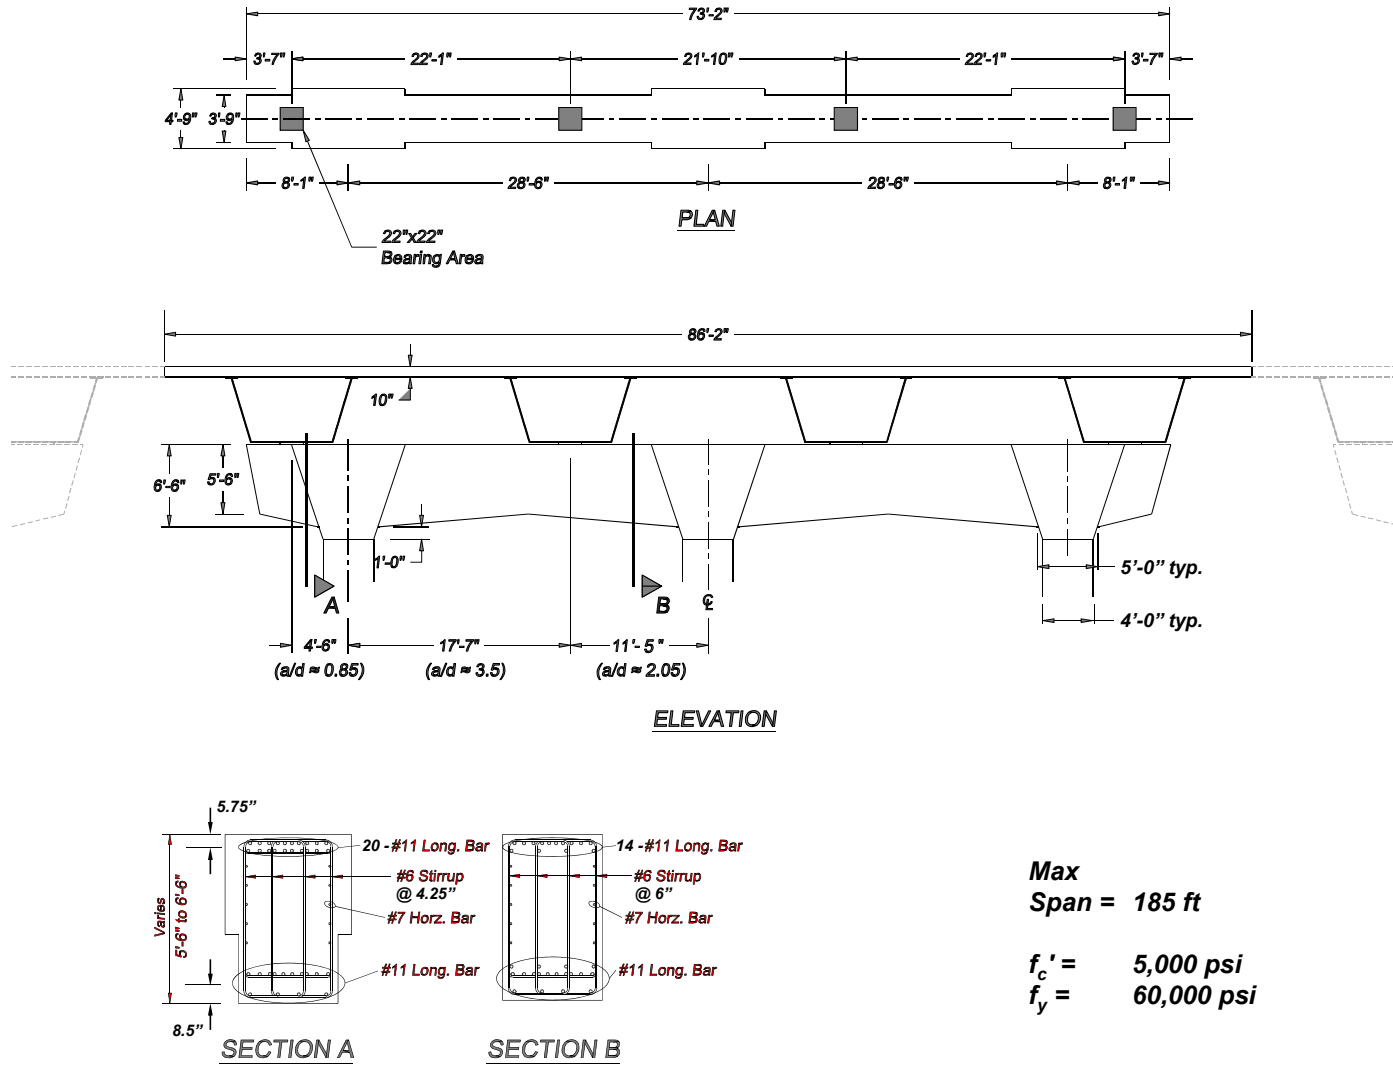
Preliminary plan; elevation; and cross-sectional details at critical shear regions.
